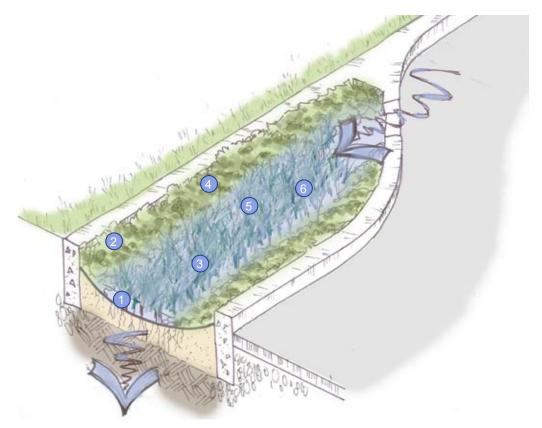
Key Design Considerations for a Stormwater Curb Extension
